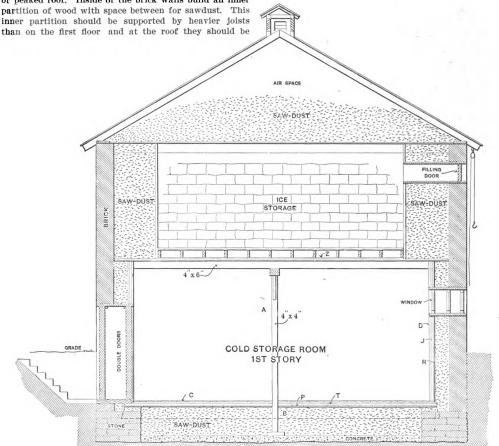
Vertical Cross Section, Showing Manner of Construction.
